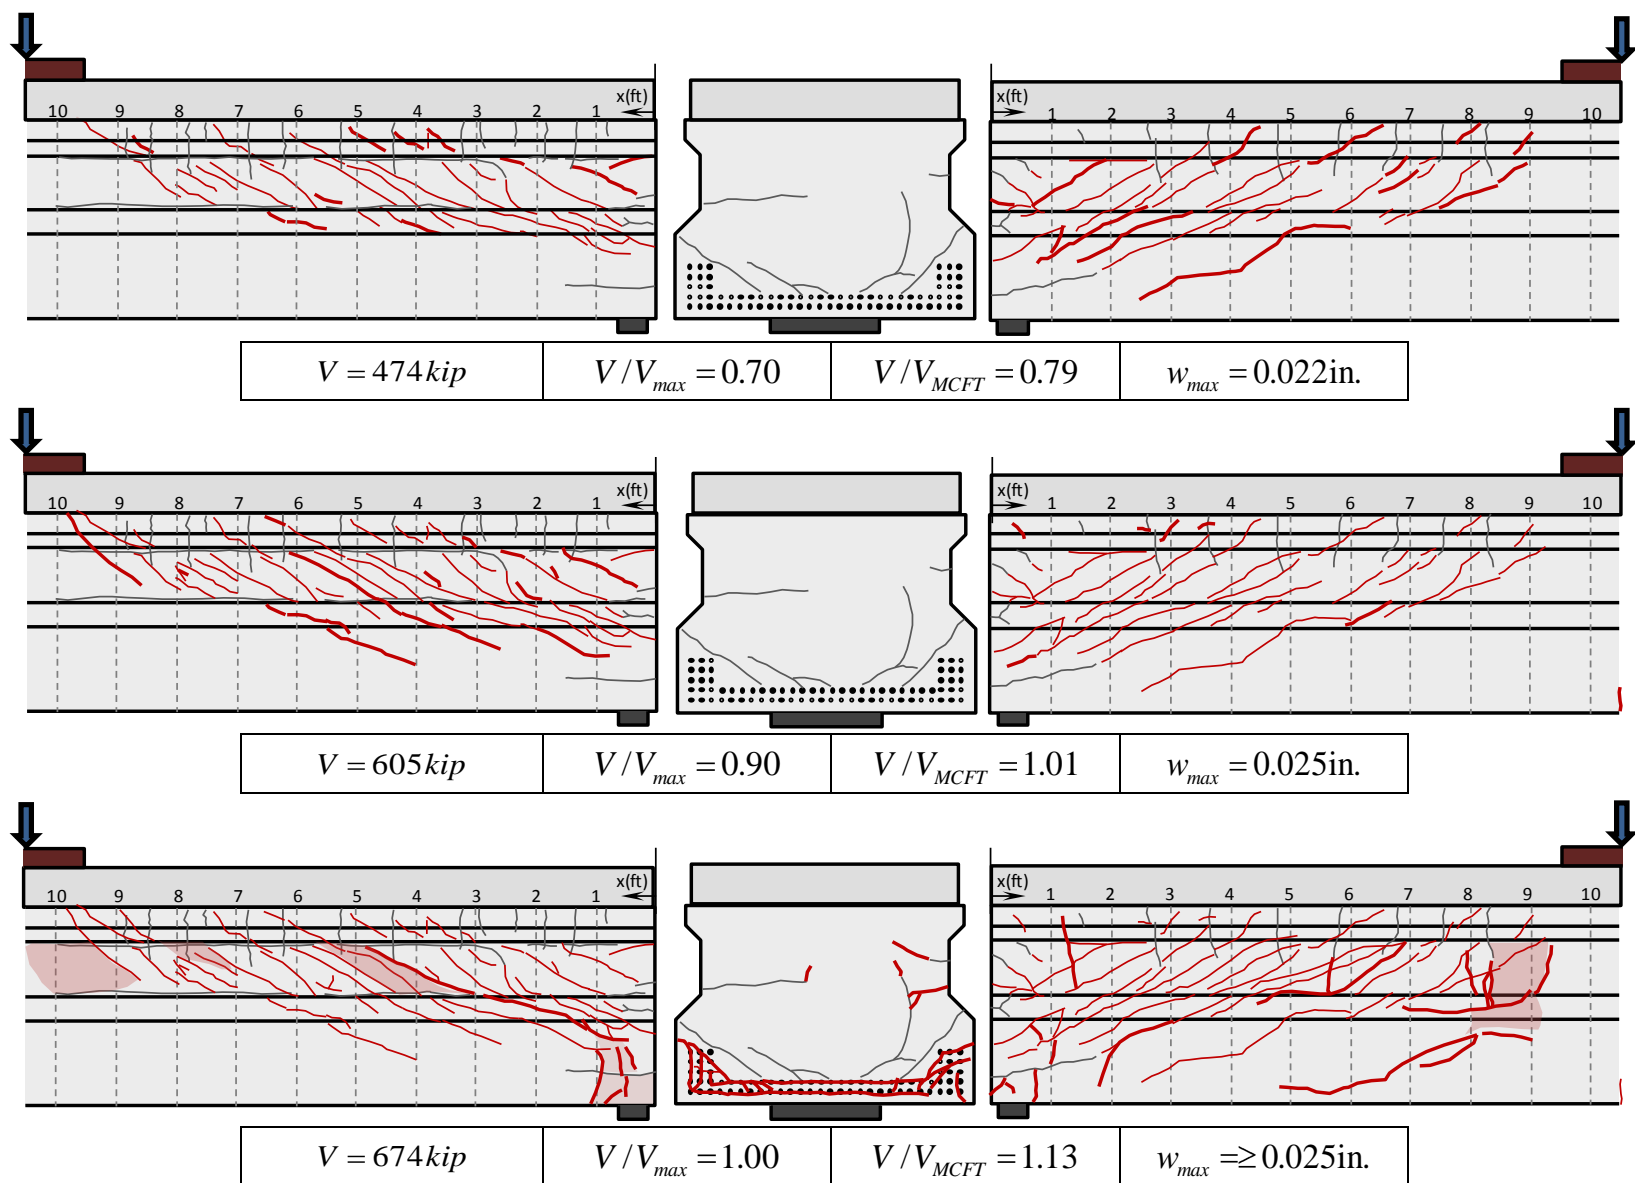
(continued): Crack Maps for 5XB40 Square End supported on a single bearing pad
